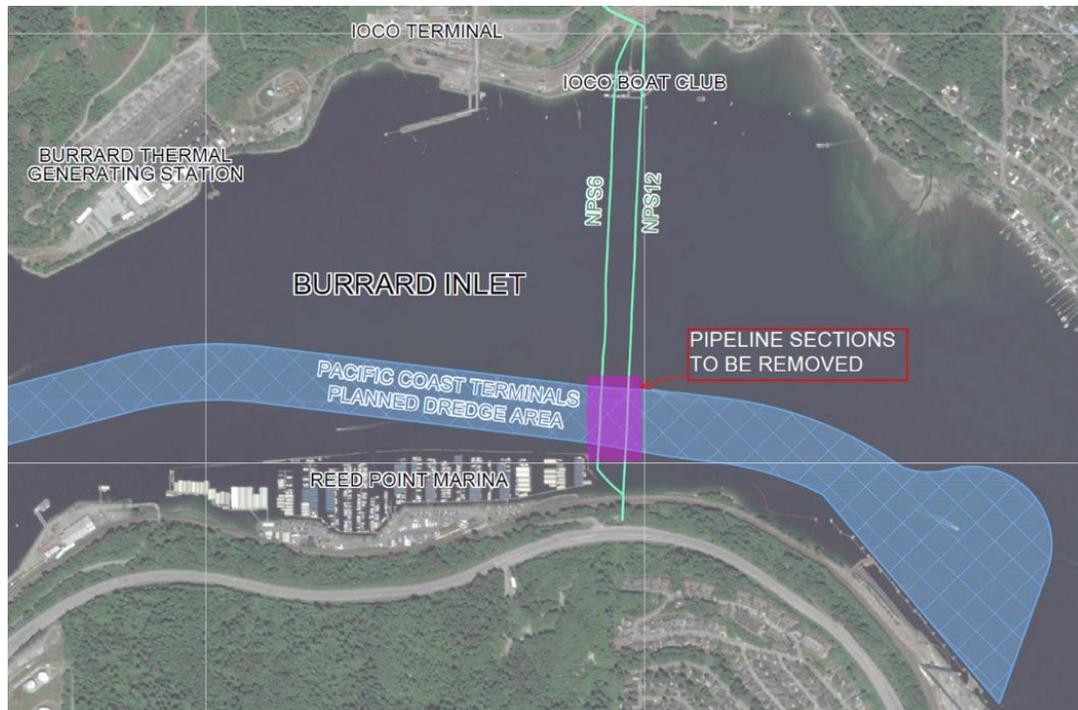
Imperial's Burrard Inlet Pipeline Removal (BIPR) Project – Site Plan
